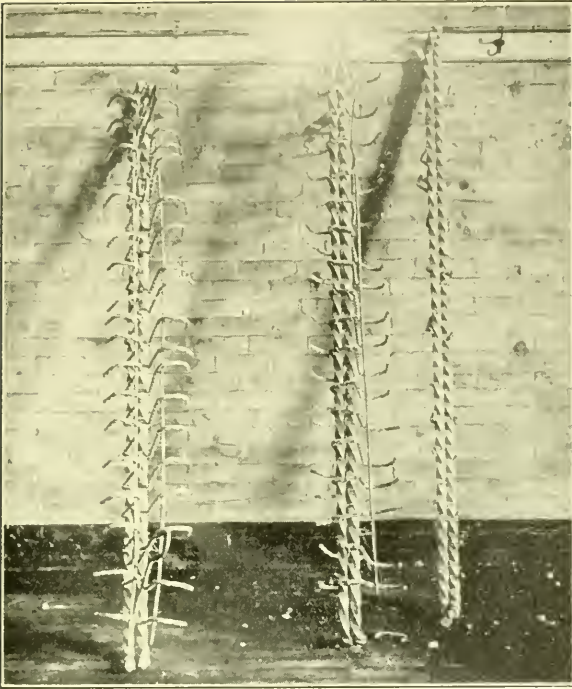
REINFORCEMENT OF THREE TYPE B BEAMS AFTER THE TEST. THE CUTTING OR REMOVAL OF THE STIRRUPS OCCURRED IN DISENGAGING THE STEEL FROM THE CONCRETE.
